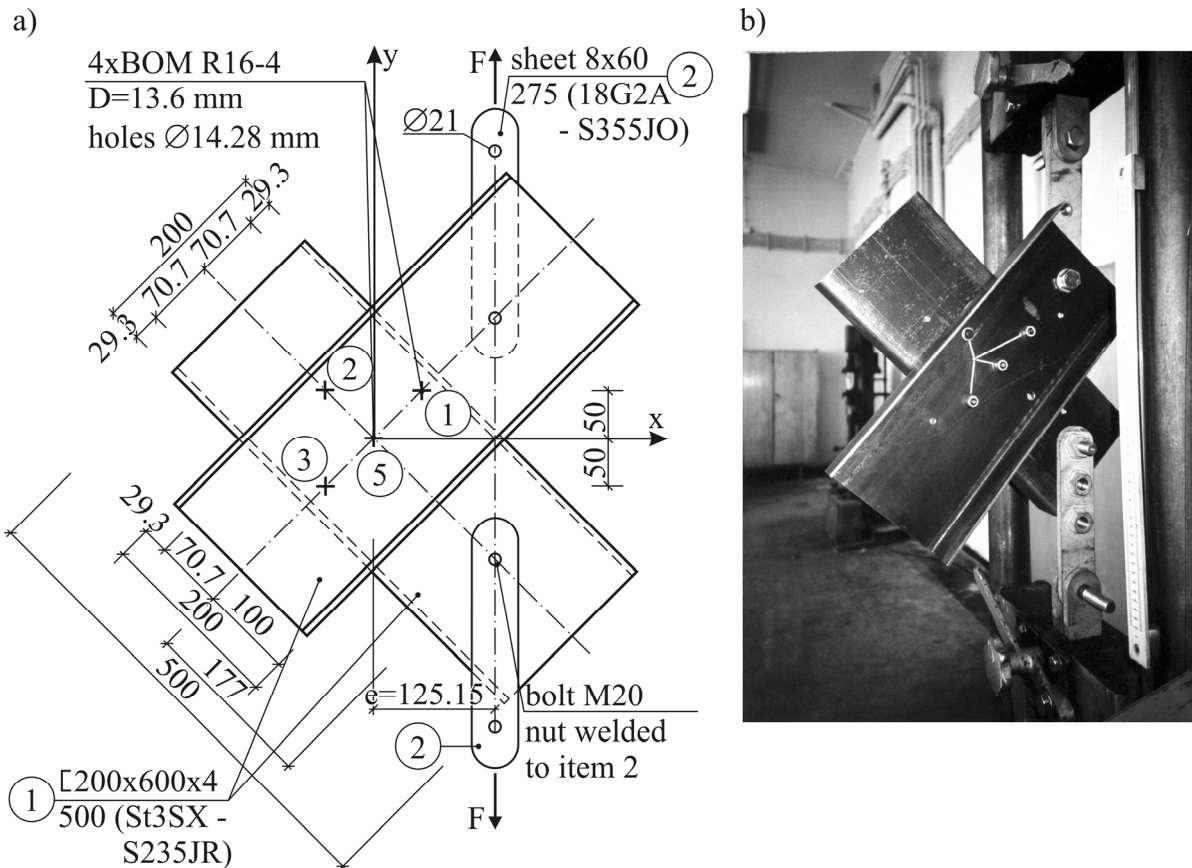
Test Element “V”: a) Construction and Dimensions, b) Element Anchored in the Press
